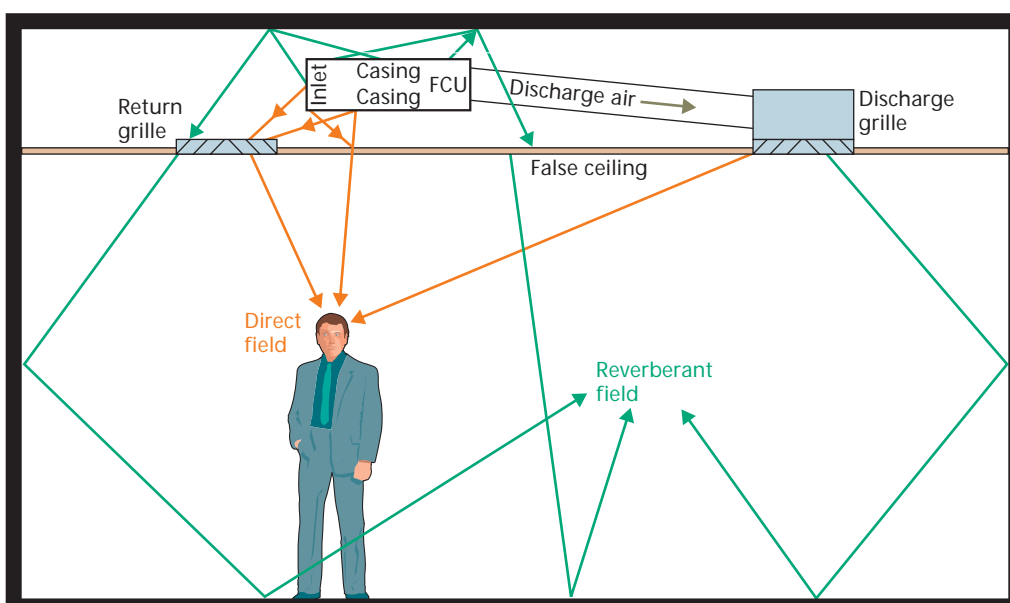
Advanced method for assessing noise in ceiling void installations (not to scale)
